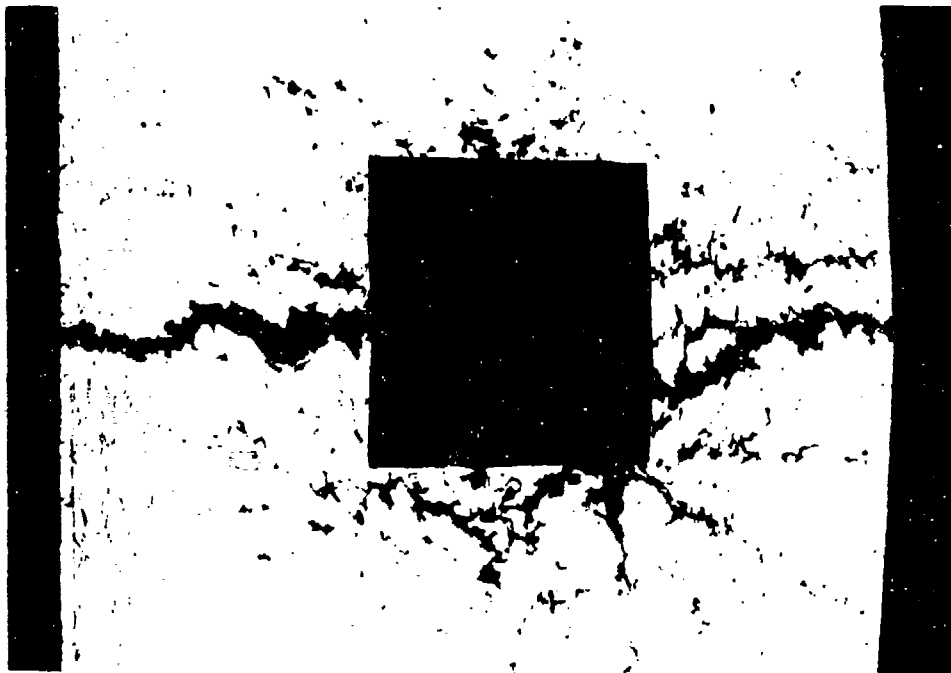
Test 18 Wall Damage Detail (Type C, 2.4-Pound Equivalent Charge).
